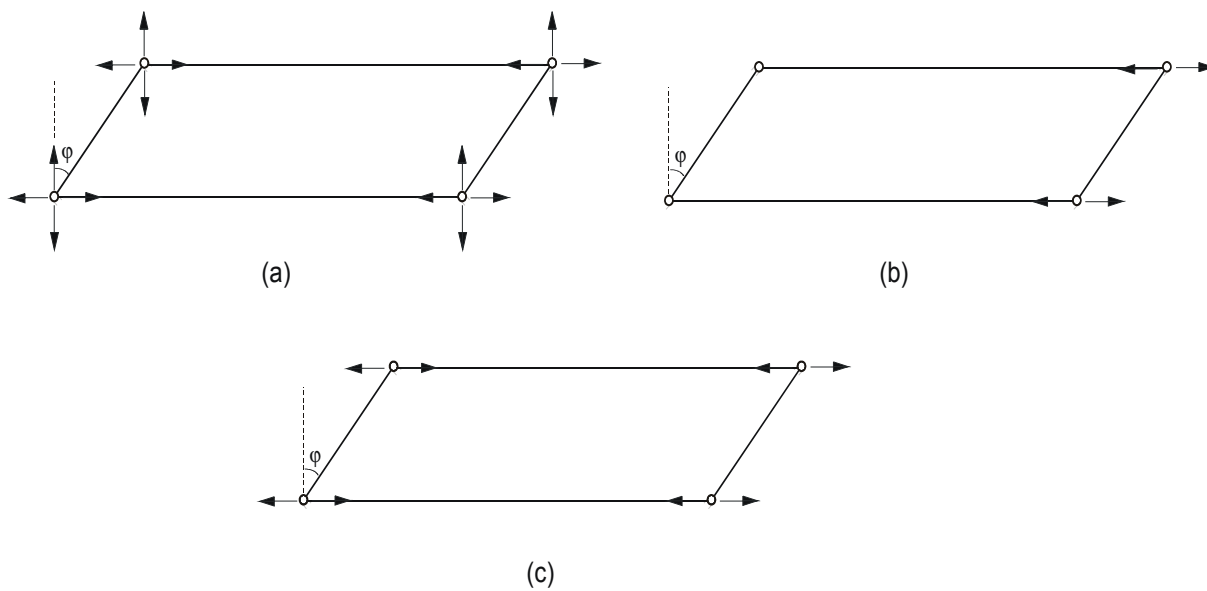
Example Boundary Conditions (Skewed Bridge Plan Layouts):
